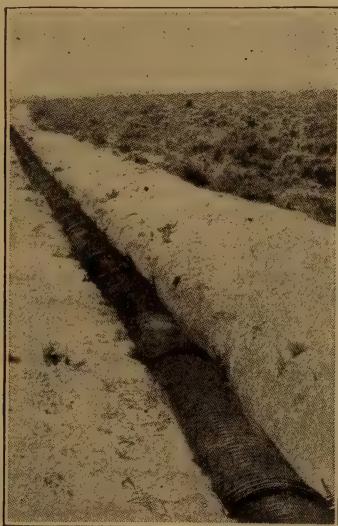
Twenty-four Inch Machine Banded Wooden Stave Pipe, Laid in Place, for Irrigation System.
